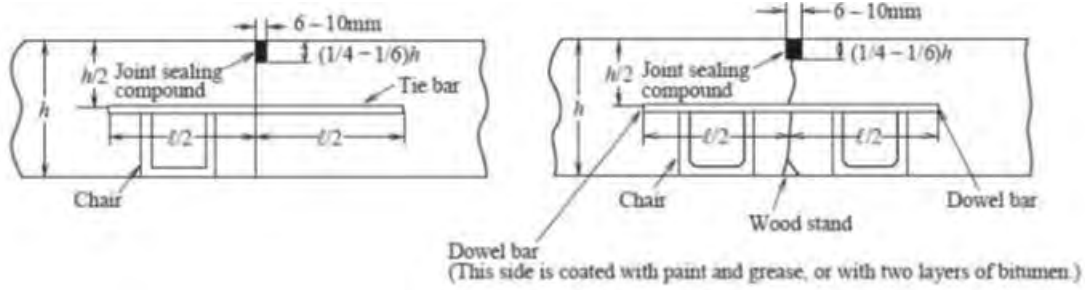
Longitudinal Construction Joint      Figure 3-13 Transverse Shrinkage Joint
